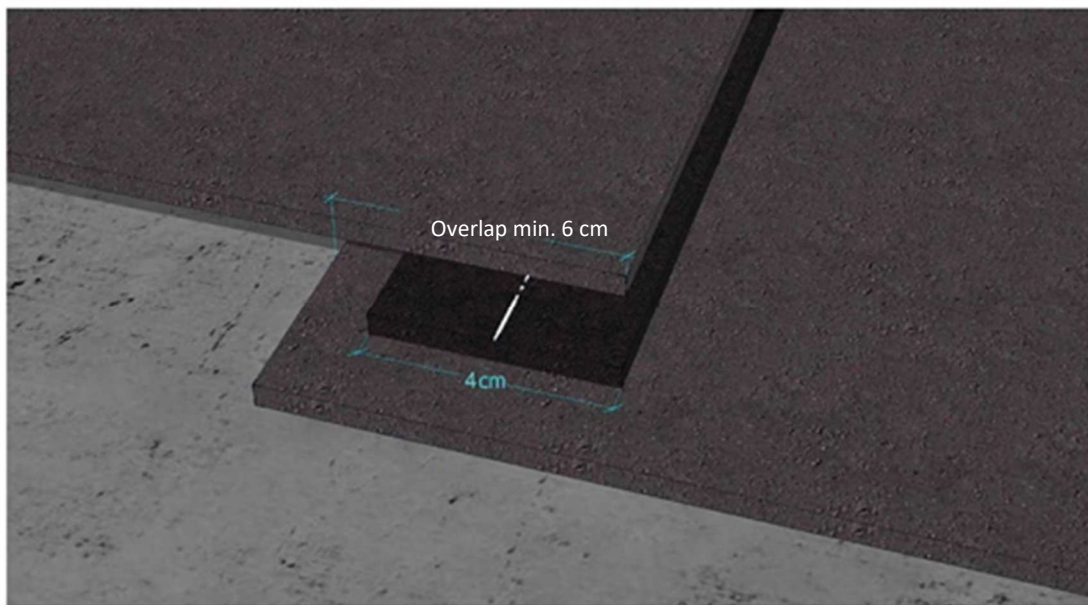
CROSS-CONNECTION OF MEMBRANE STRIPS – VIEW
